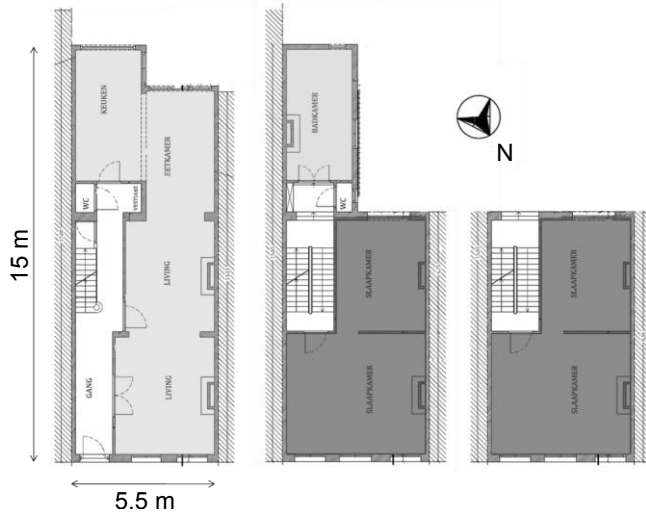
Floor plans of the three storey house with the ground floor (left), first floor (middle) and second floor (right). Light grey indicates ZONE I (living zone), dark grey ZONE II (sleeping zone) and white ZONE III (hallway). Basement floor is identical to ground floor.
